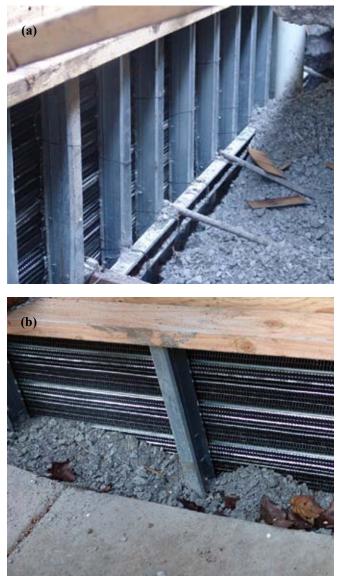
(a) and (b): Back side view reveals minimal overexcavation. Alternative form materials will remain in place
